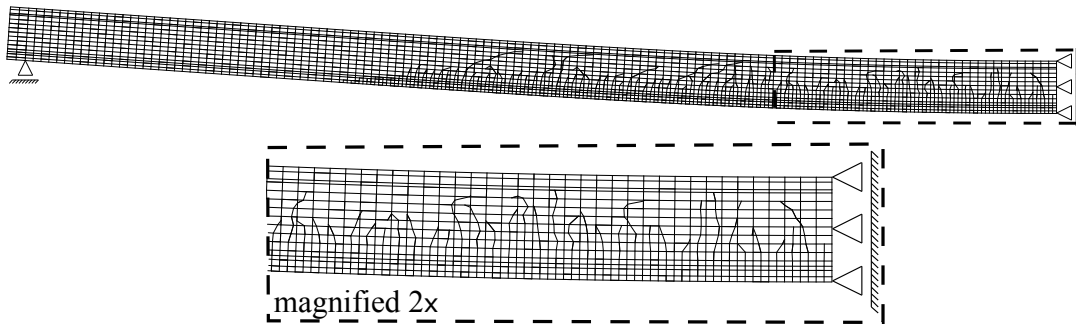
Deformed shape and crack pattern at failure of CFRP strengthened girder.
